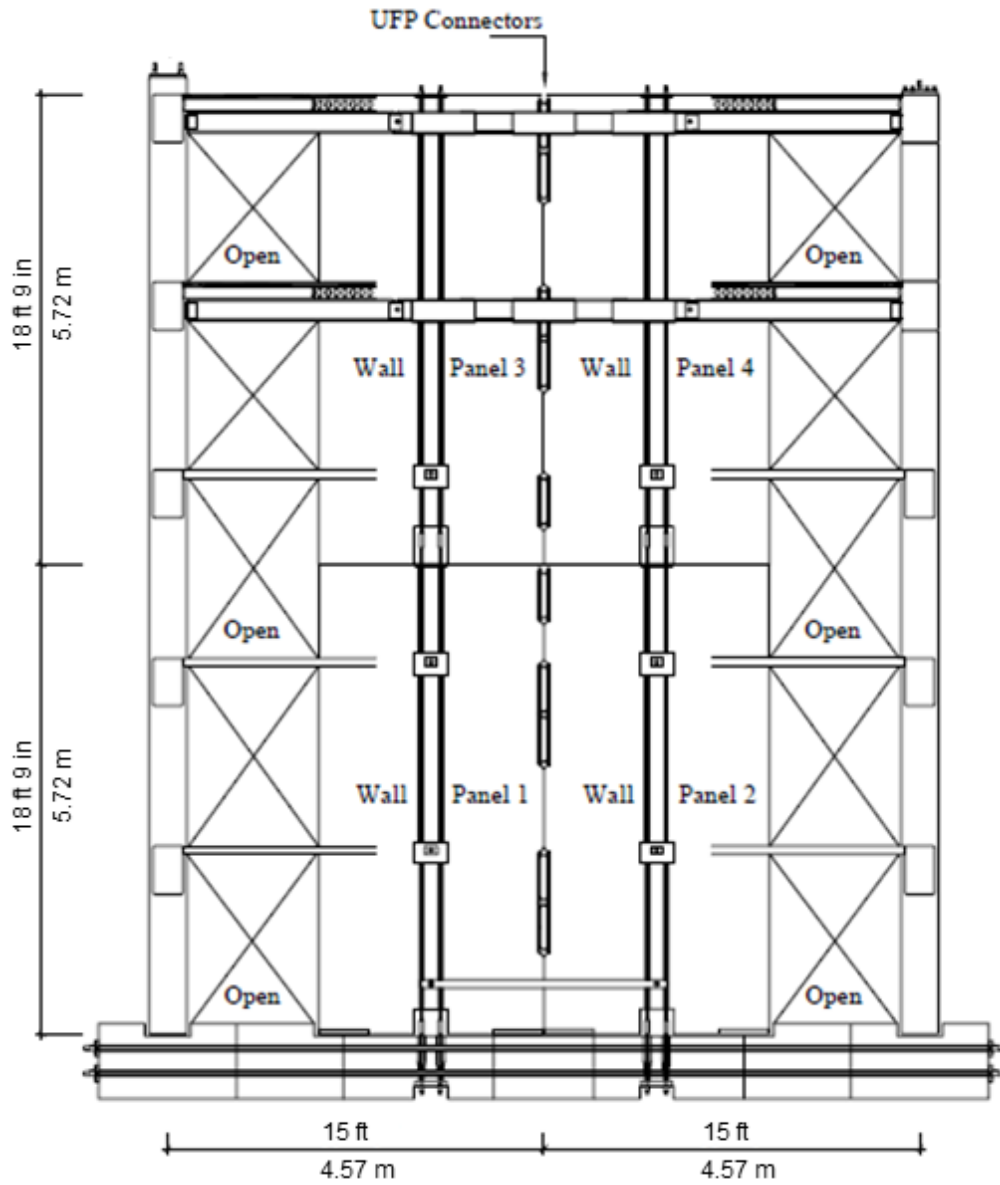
Elevation of the unbonded post-tensioned jointed precast wall, [10]
